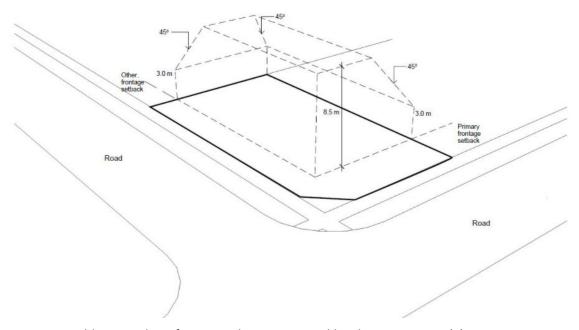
Building envelope for corner lots as required by clause 10.4.2 A3(a)
